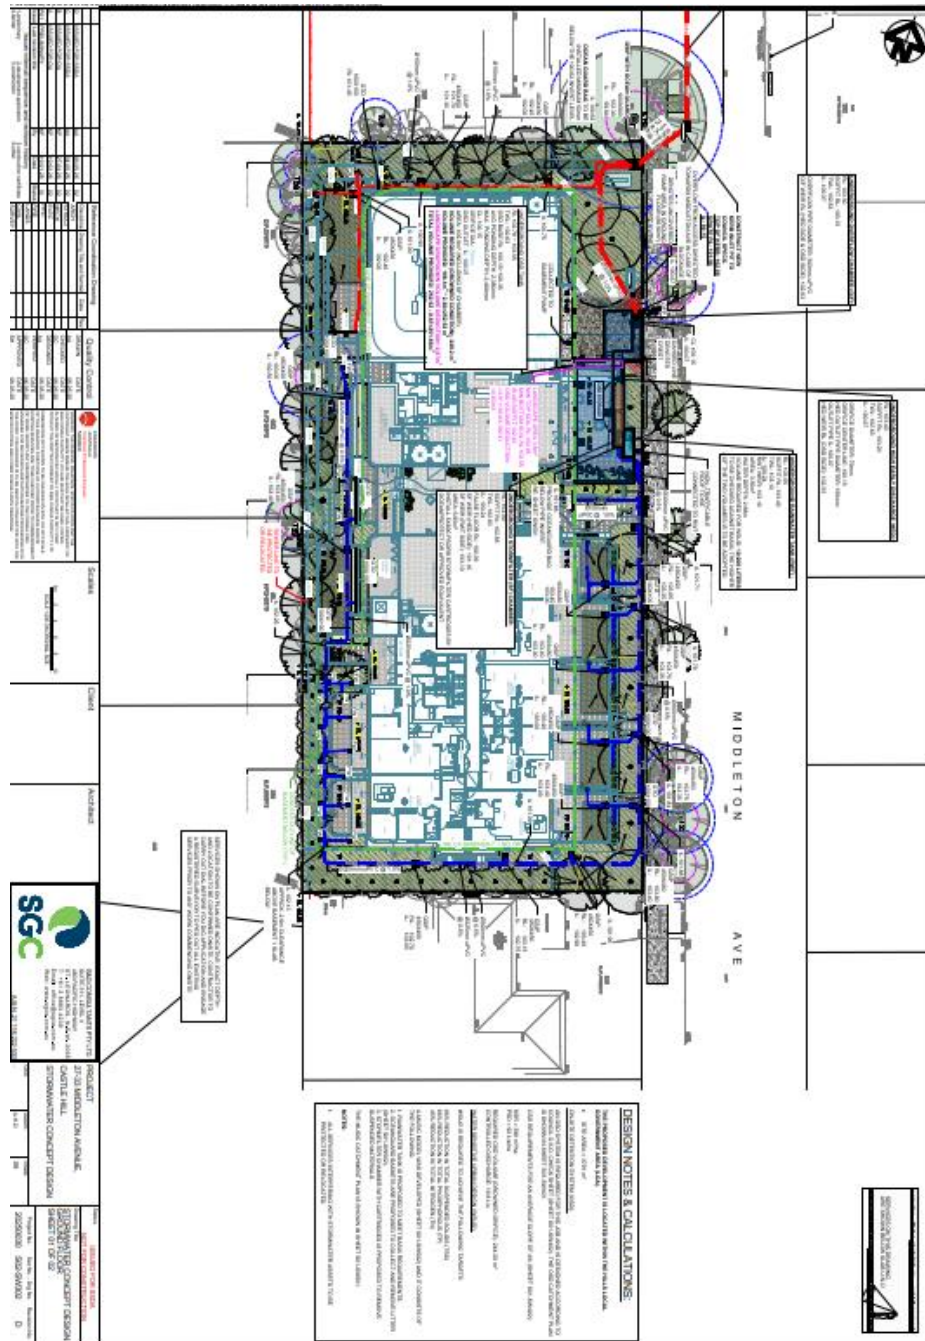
Ground Floor Stormwater Plan (S02-SW302)
